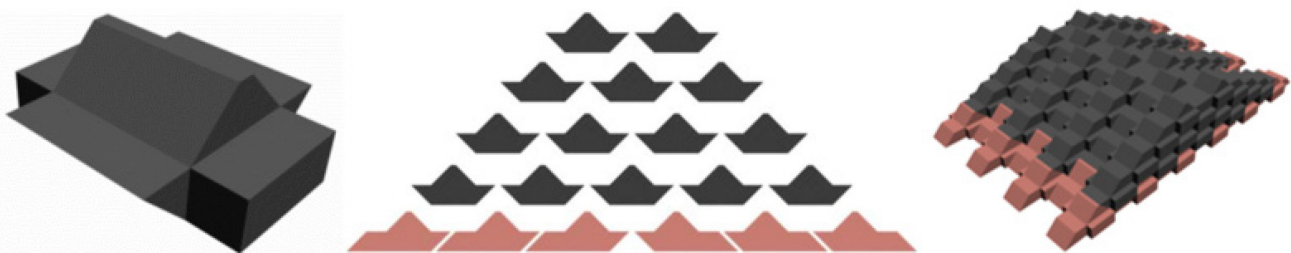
Images of a single element (left), construction scheme (center) and a 3D view (right) of the modular barrier (Monroy 2013).
